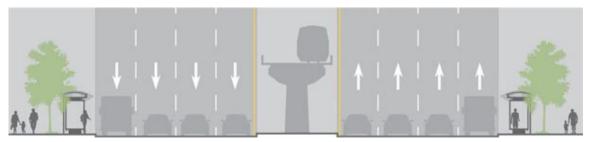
| Alternative 2 cross-section of Tyco Road from Route 7 to Spring Hill Road
